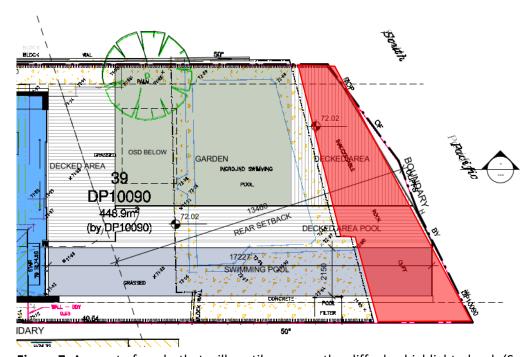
Amount of works that will cantilever over the cliff edge highlighted red. (Source: OROSI, 2021)
